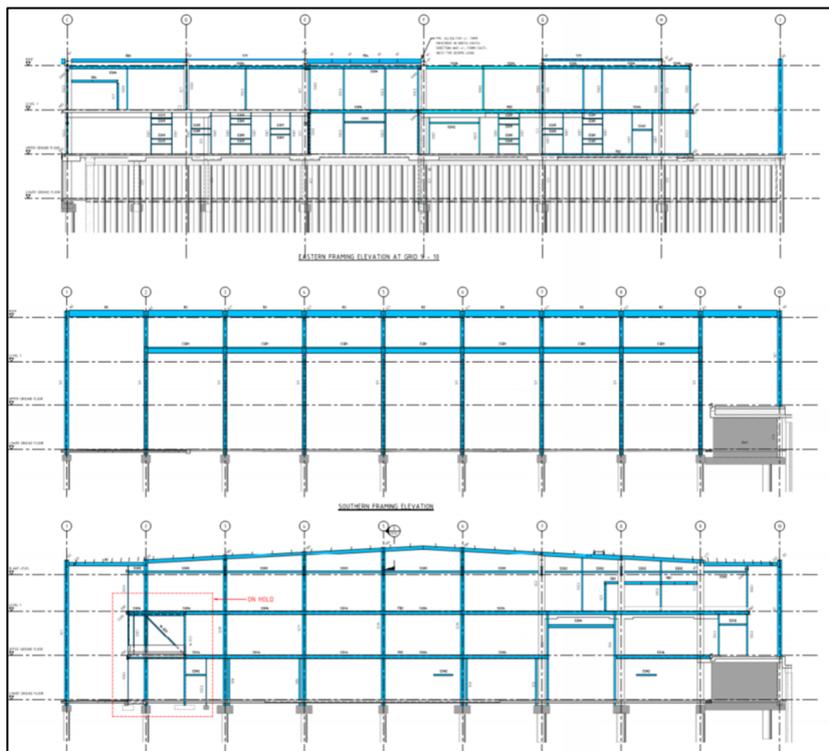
Full Building Structure- Example- Structural Steel
